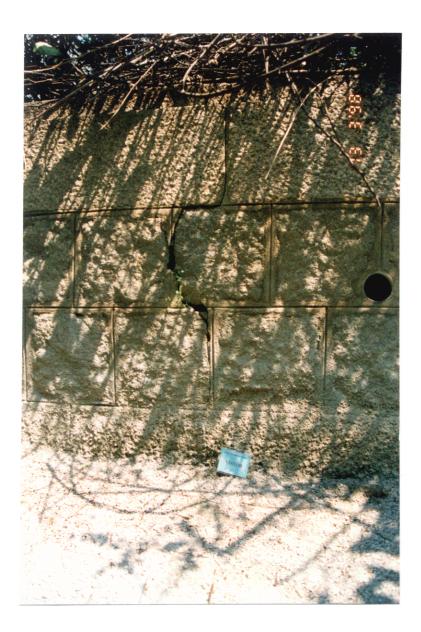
Crack in the Retaining Wall above the Landslide (Photograph Taken on 13 March 1998)
